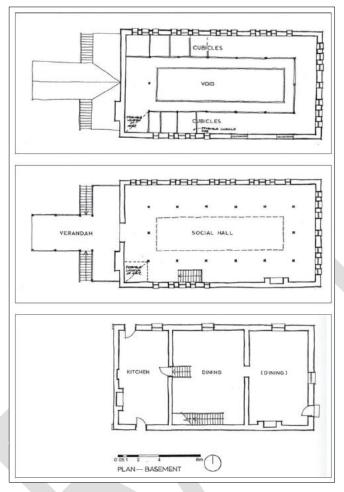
Assumed original configuration of the building, showing first and second floor galleries at top, ground floor at centre and basement at bottom. (Source: 1990 Conservation Plan)
